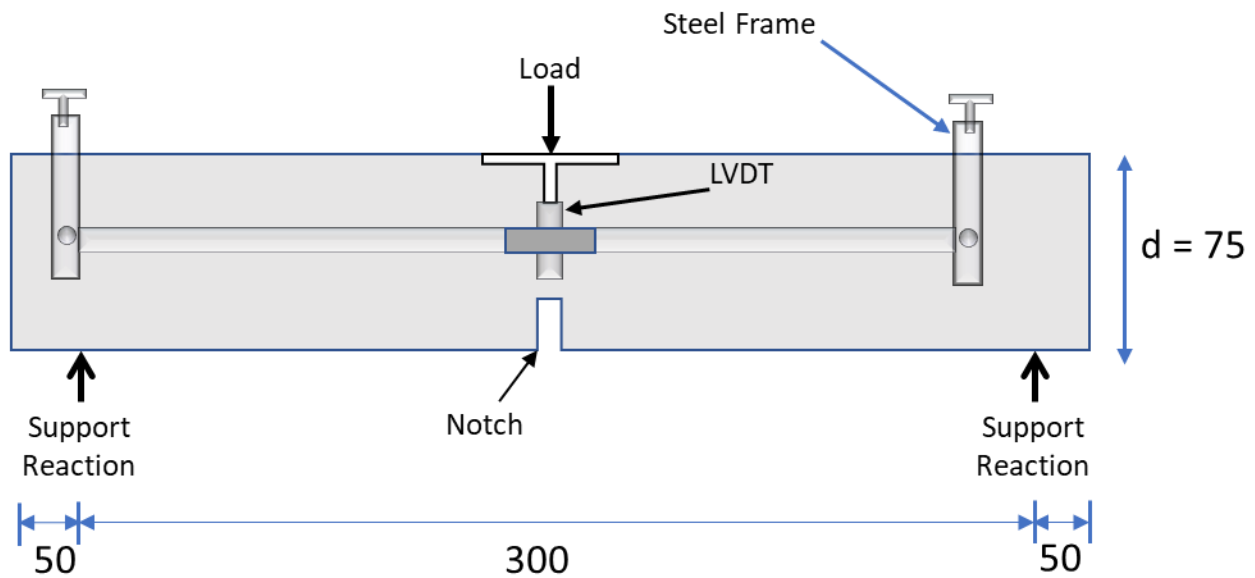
Flexural test setup and notched beam specimen. Unit: millimeter, (Meng et al. 2017)
